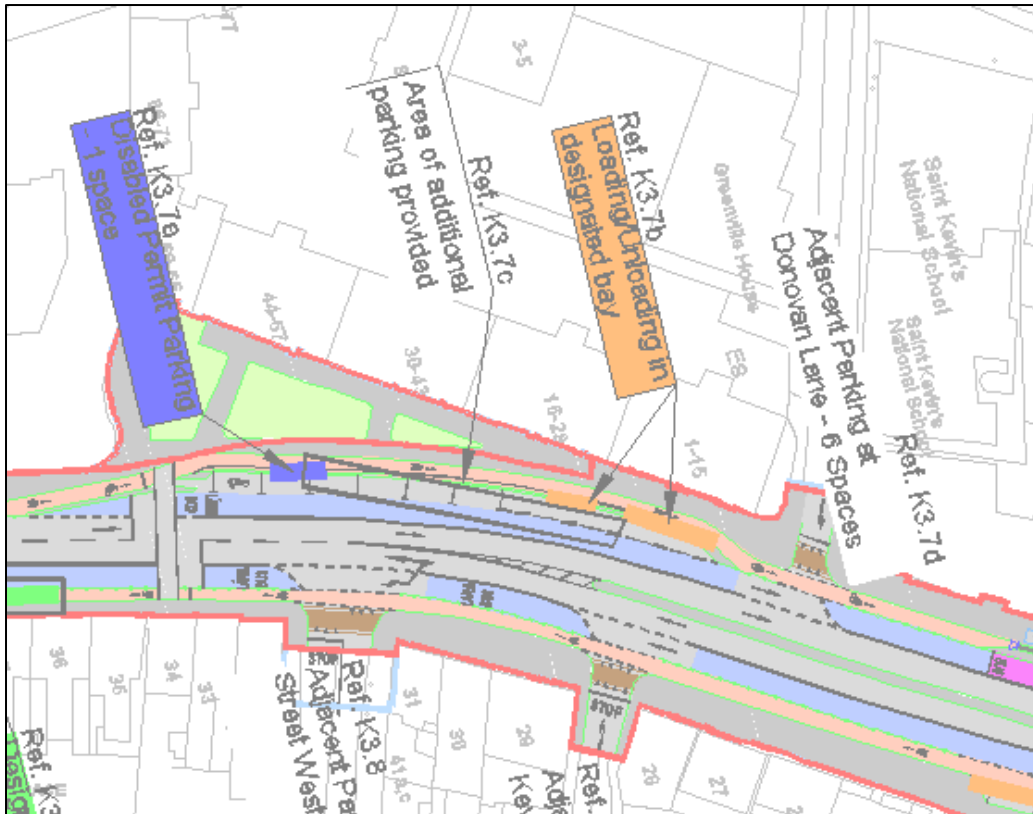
Proposed scheme design and parking changes along Clanbrassil Street Lower (across from Lombard Street West junction).
